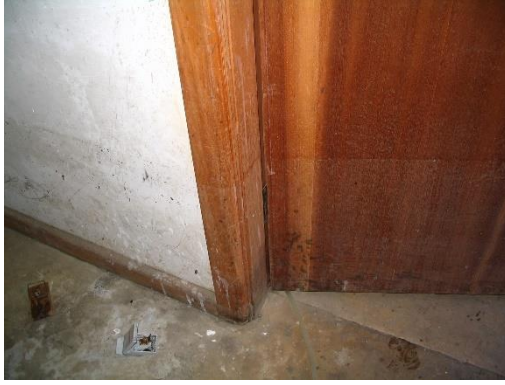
Flooding 01/06/2019 – Water Level 10 School Road Photo 5
